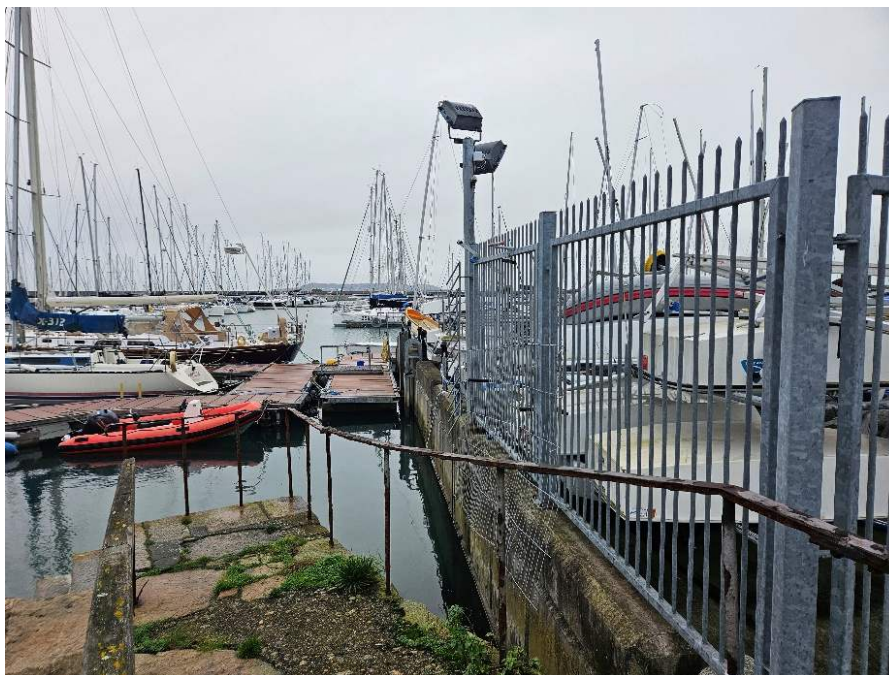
North facing view of eastern end of the pontoons adjacent to access via reclaimed land. [JM 05/12/25]
